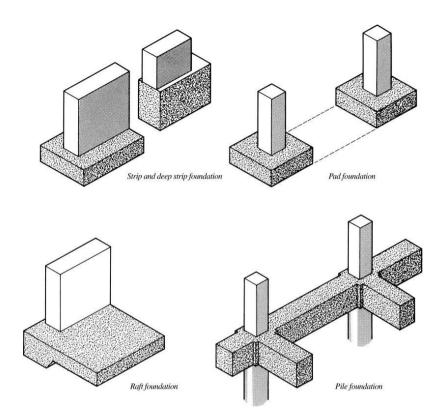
Different types of foundation are used according to subsoil conditions and the form of building to be supported.
